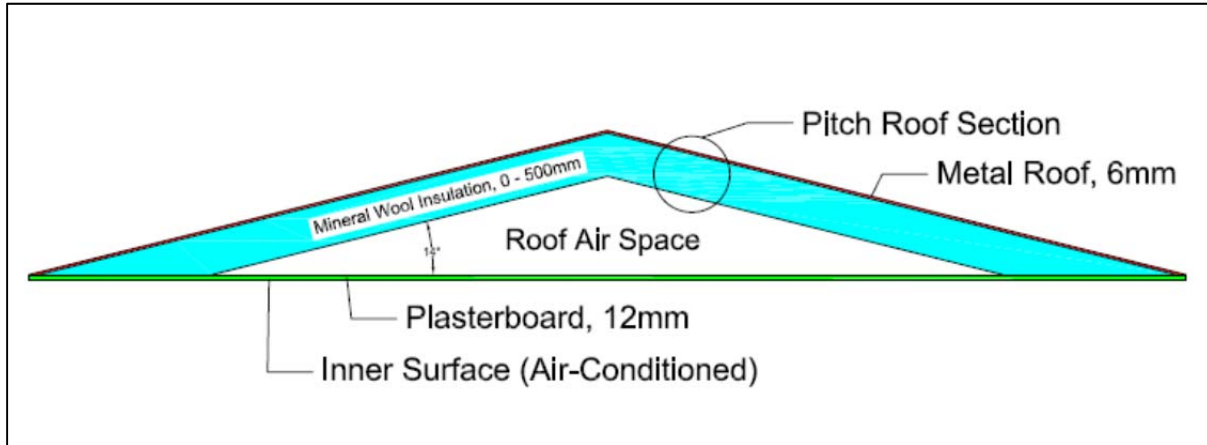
Cross-Section of a Pitch Roof Construction with Plasterboard as Ceiling
